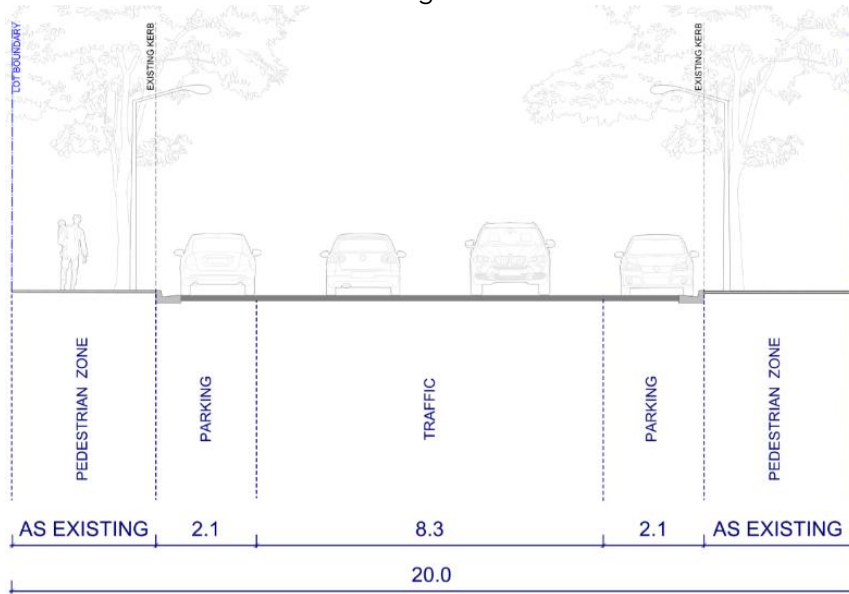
Street Section - Cooper Street South (Aspect Studios)
